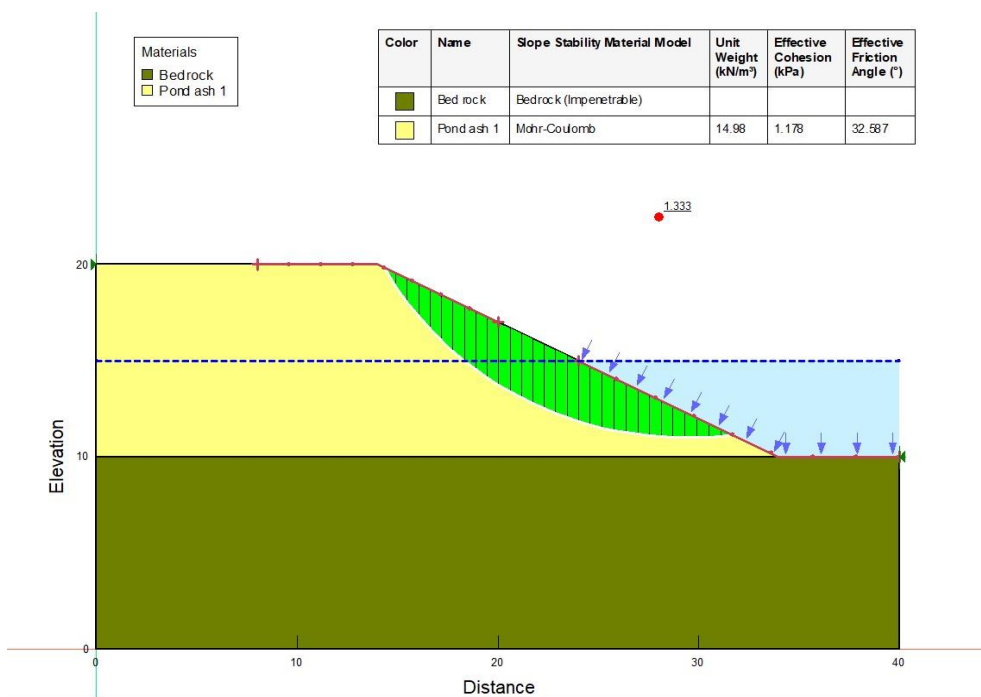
Design of Pond Ash Embankment of 4 m height at slope 1V:2H
